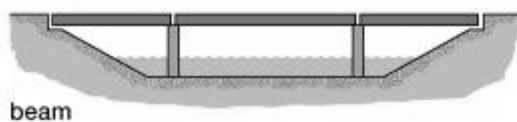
Beam and slab bridge (Billington P. 2015)
